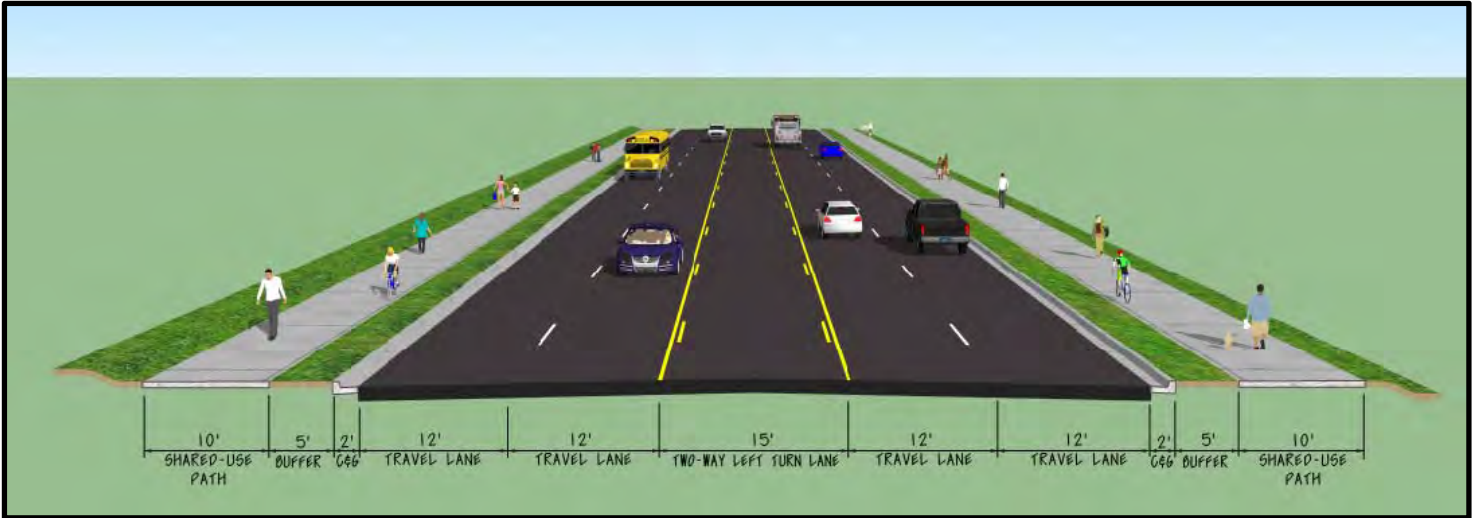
Exhibit B: Shared-Use Path Typical Section on Widening Project (Roadway Capacity Project)
